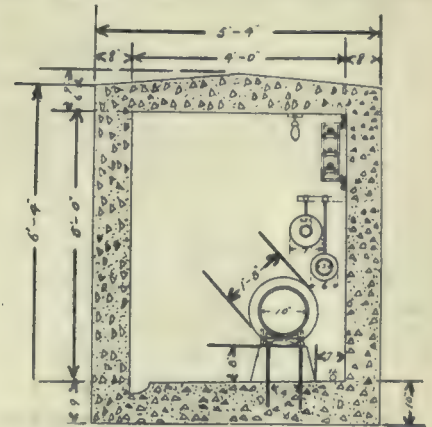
SECTION OF TUNNEL CONNECTING KNOX COLLEGE WITH CON-VOCATION HALL
